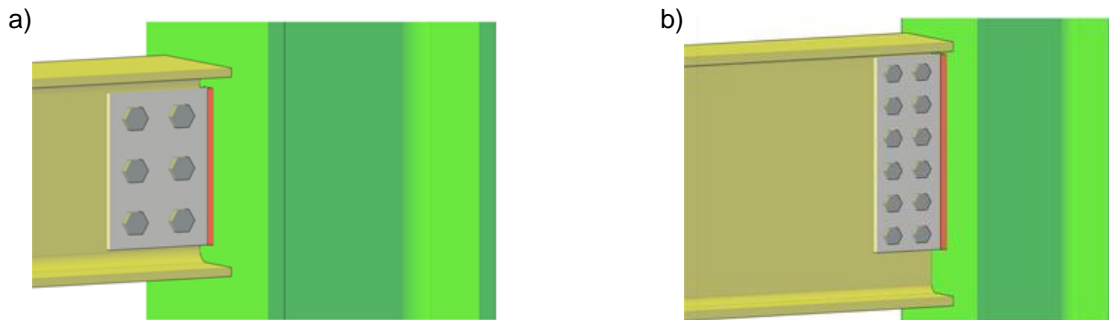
a) Test #1 and #2 shear tab specimens, b) Test #3 and #4 shear tab specimens
